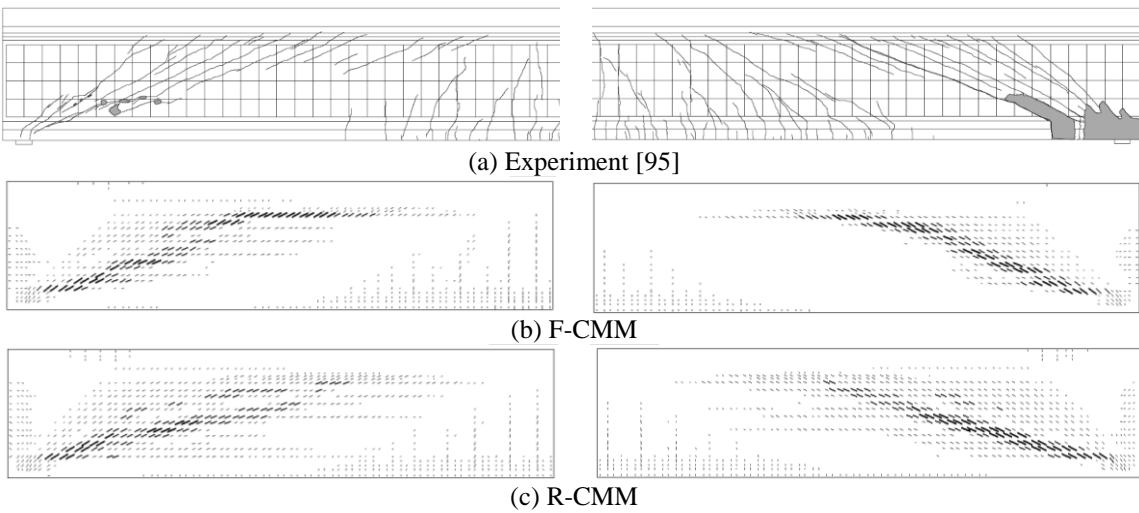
Beams G5E and G5W: cracking patterns at failure.
